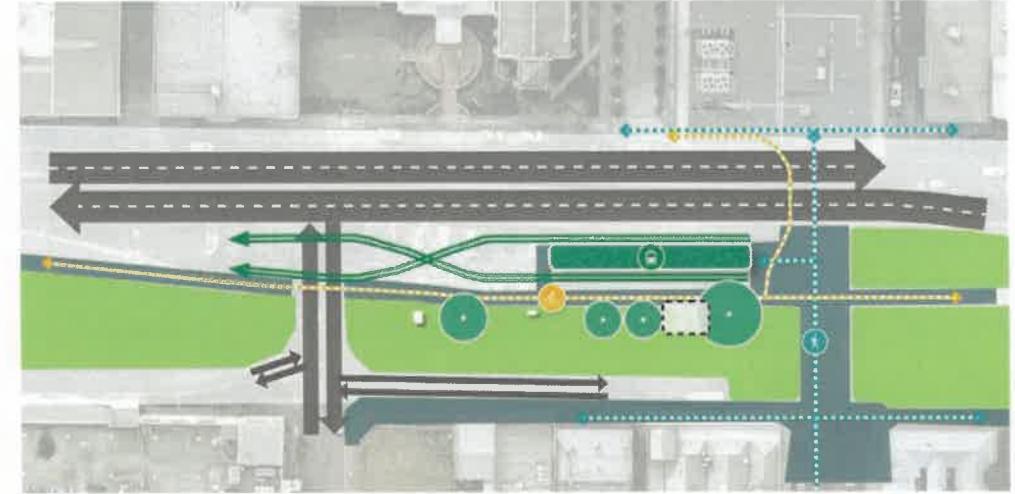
Stage 3 - Completion of SRL station, realignment of Whitehorse Road to the north and conversion of southern road reserve to linear open space (design and layout to be confirmed through future UDLP)
